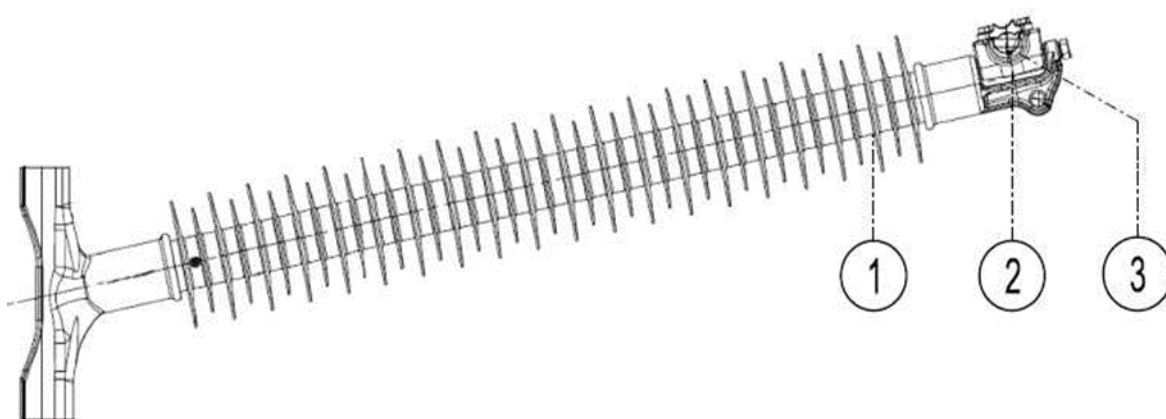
Phase Conductor Single Jumper Support Assembly for Single “Conductor”
